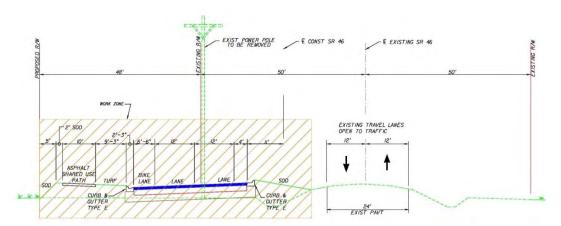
Suburban North Section Temporary Traffic Control – Phase I
